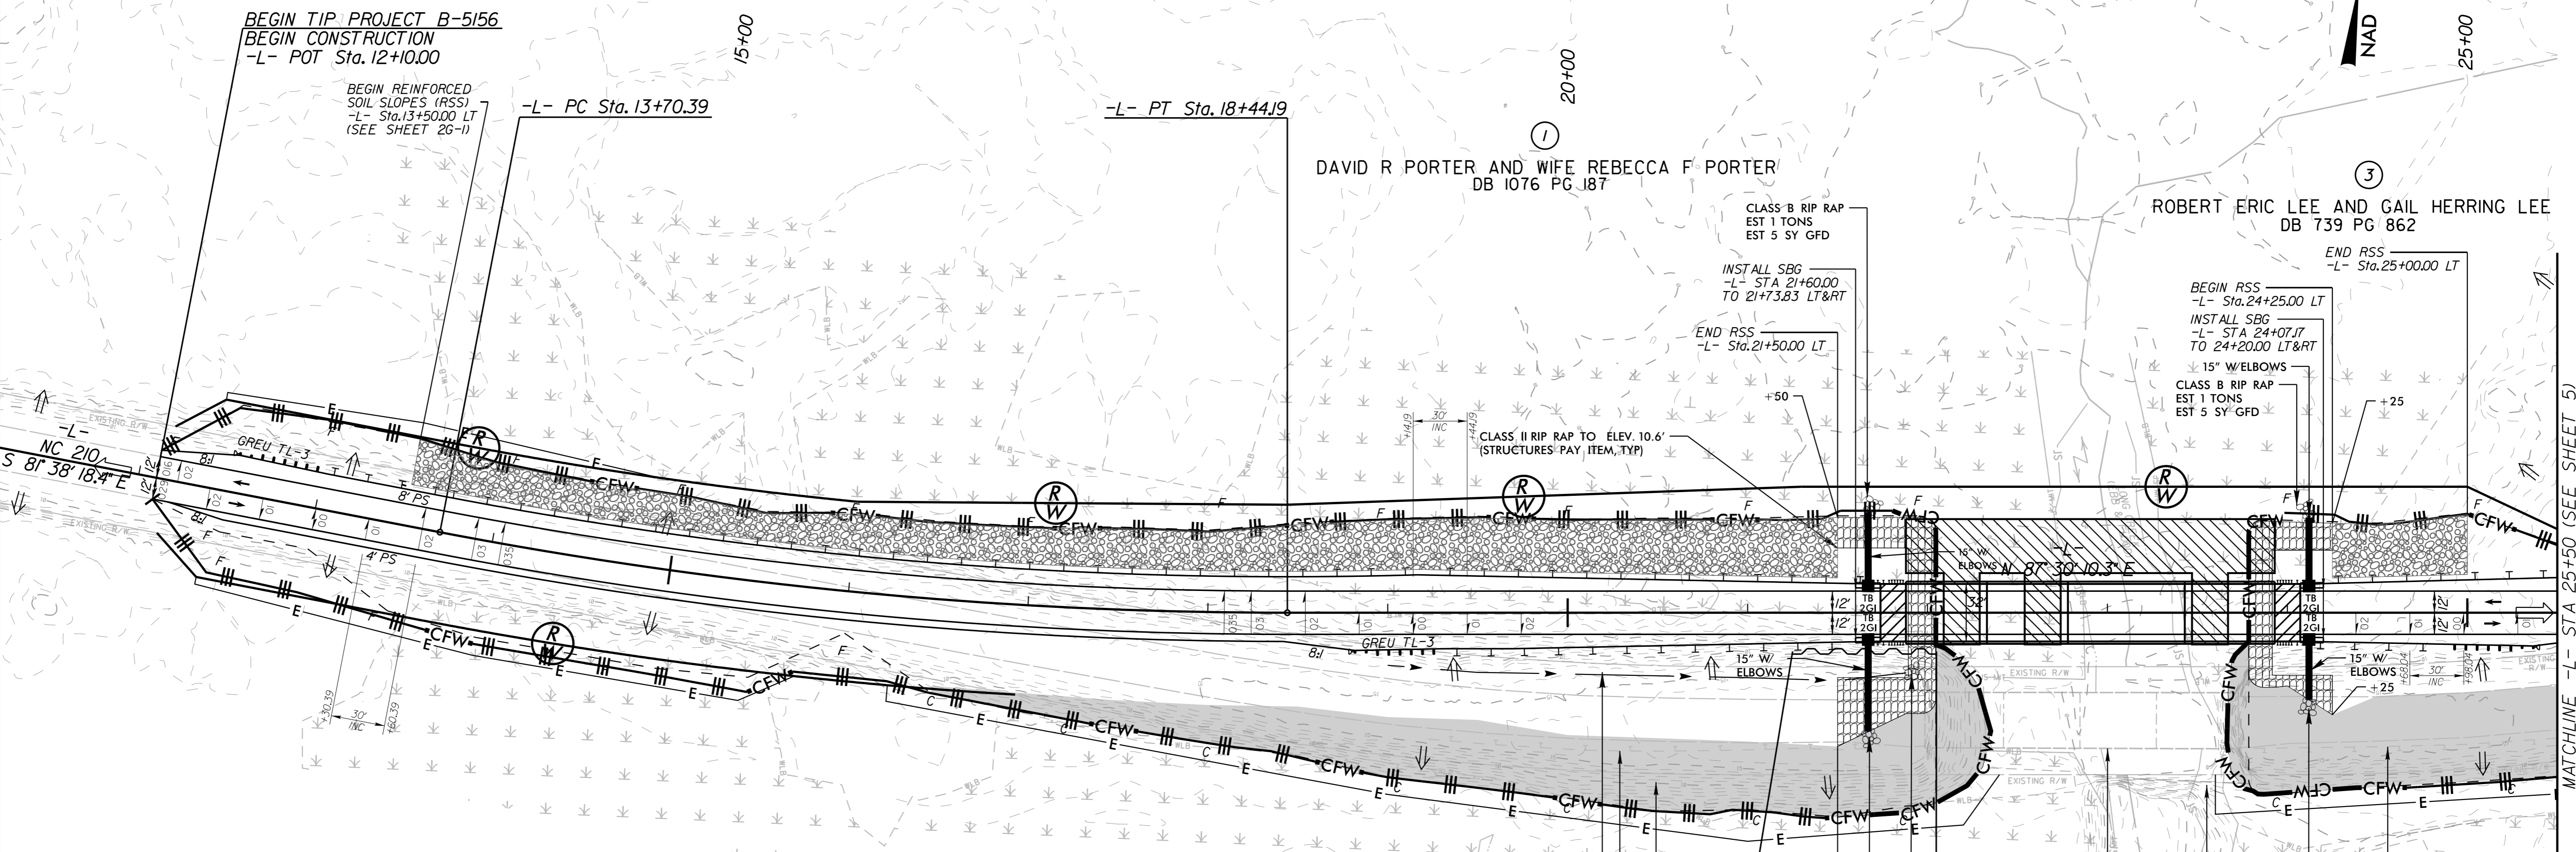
DETAIL SHOWING BRIDGE / PAVEMENT RELATIONSHIP
